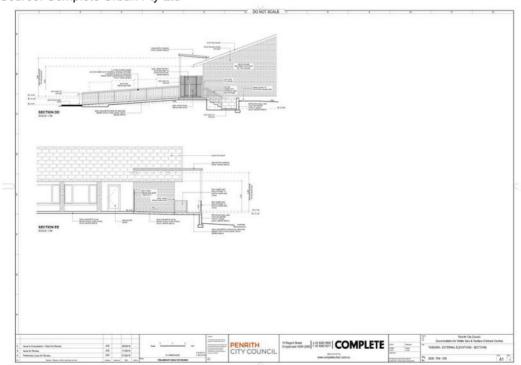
Proposed Detail Elevations (Exterior Works) Source: Complete Urban Pty Ltd
